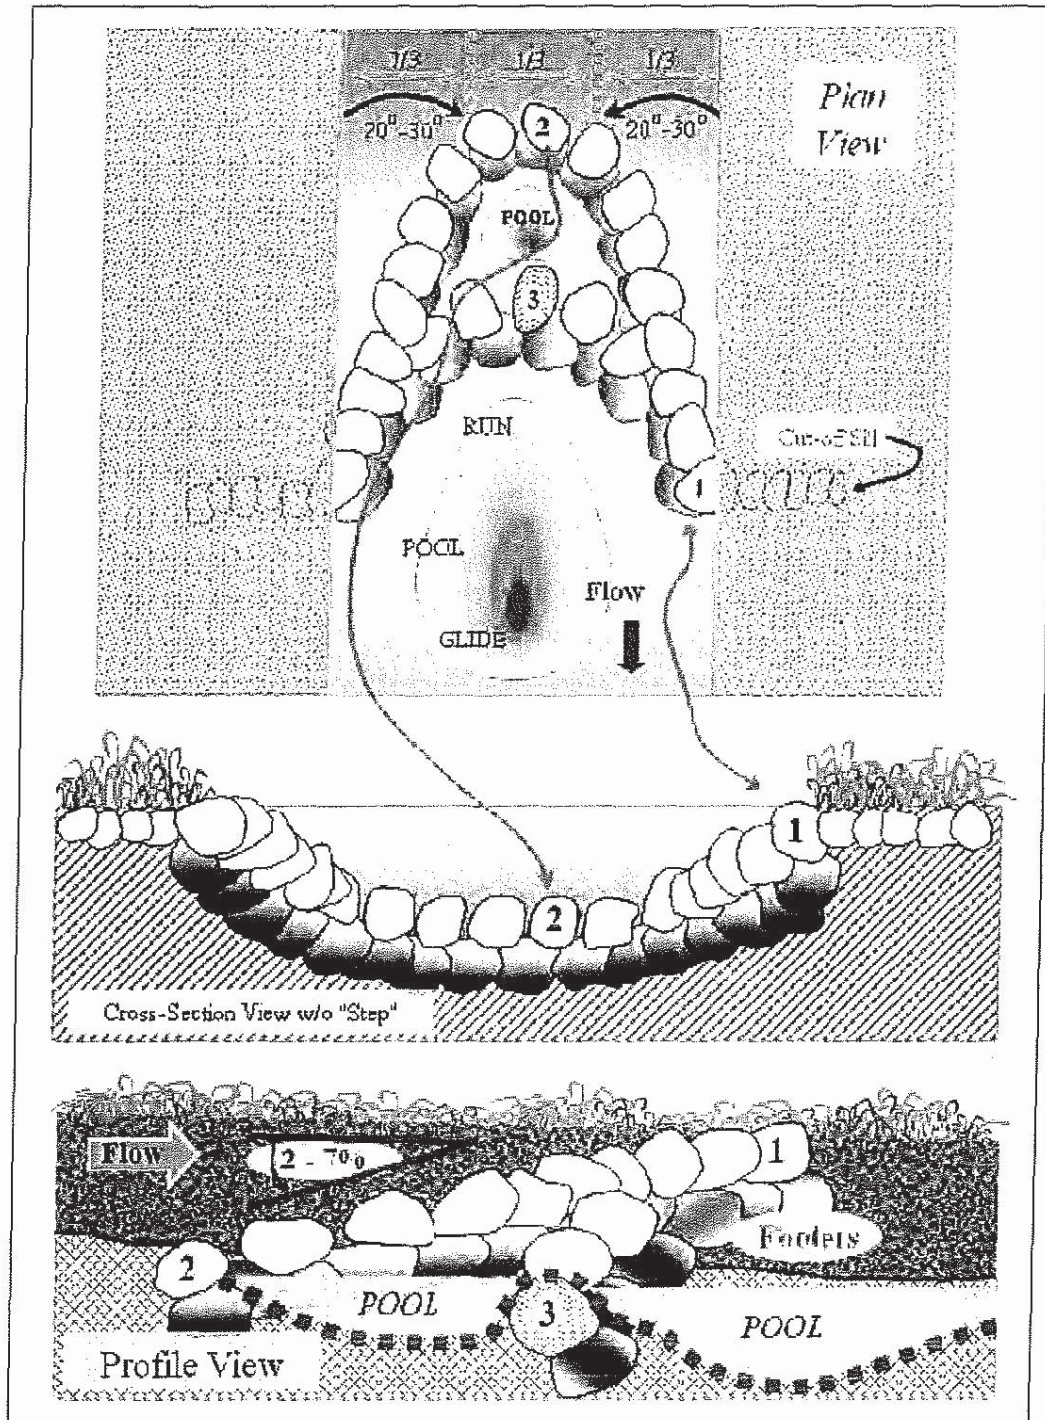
Cross section, profile and plan view of a cross vane (NRCS, 2007).
